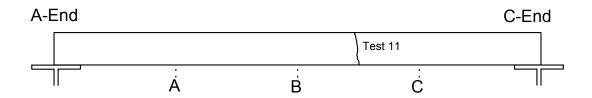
Cracks formed during concentrated load tests of the recast fiber-reinforced slab 2 (Recast STRUX 2)
